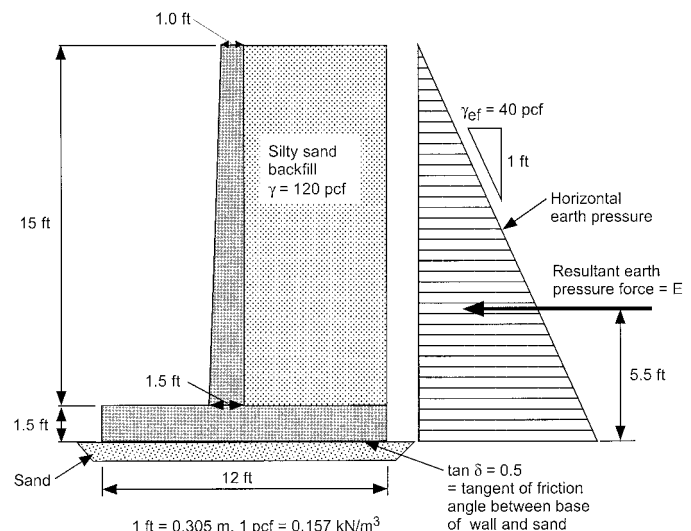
Cantilever Retaining Wall with Silty Sand Backfill
